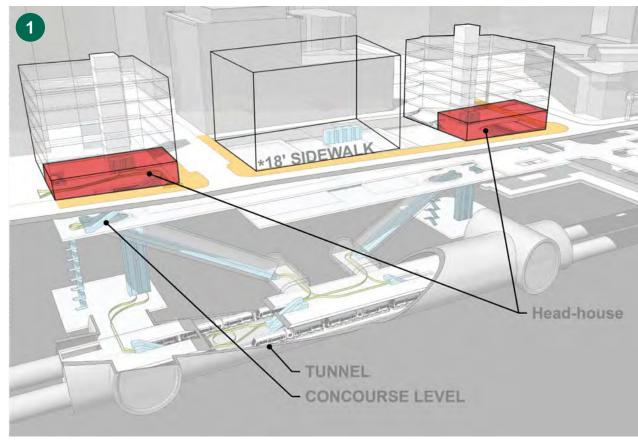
D - Station Box outside of ROW - head-houses integrated to joint development
